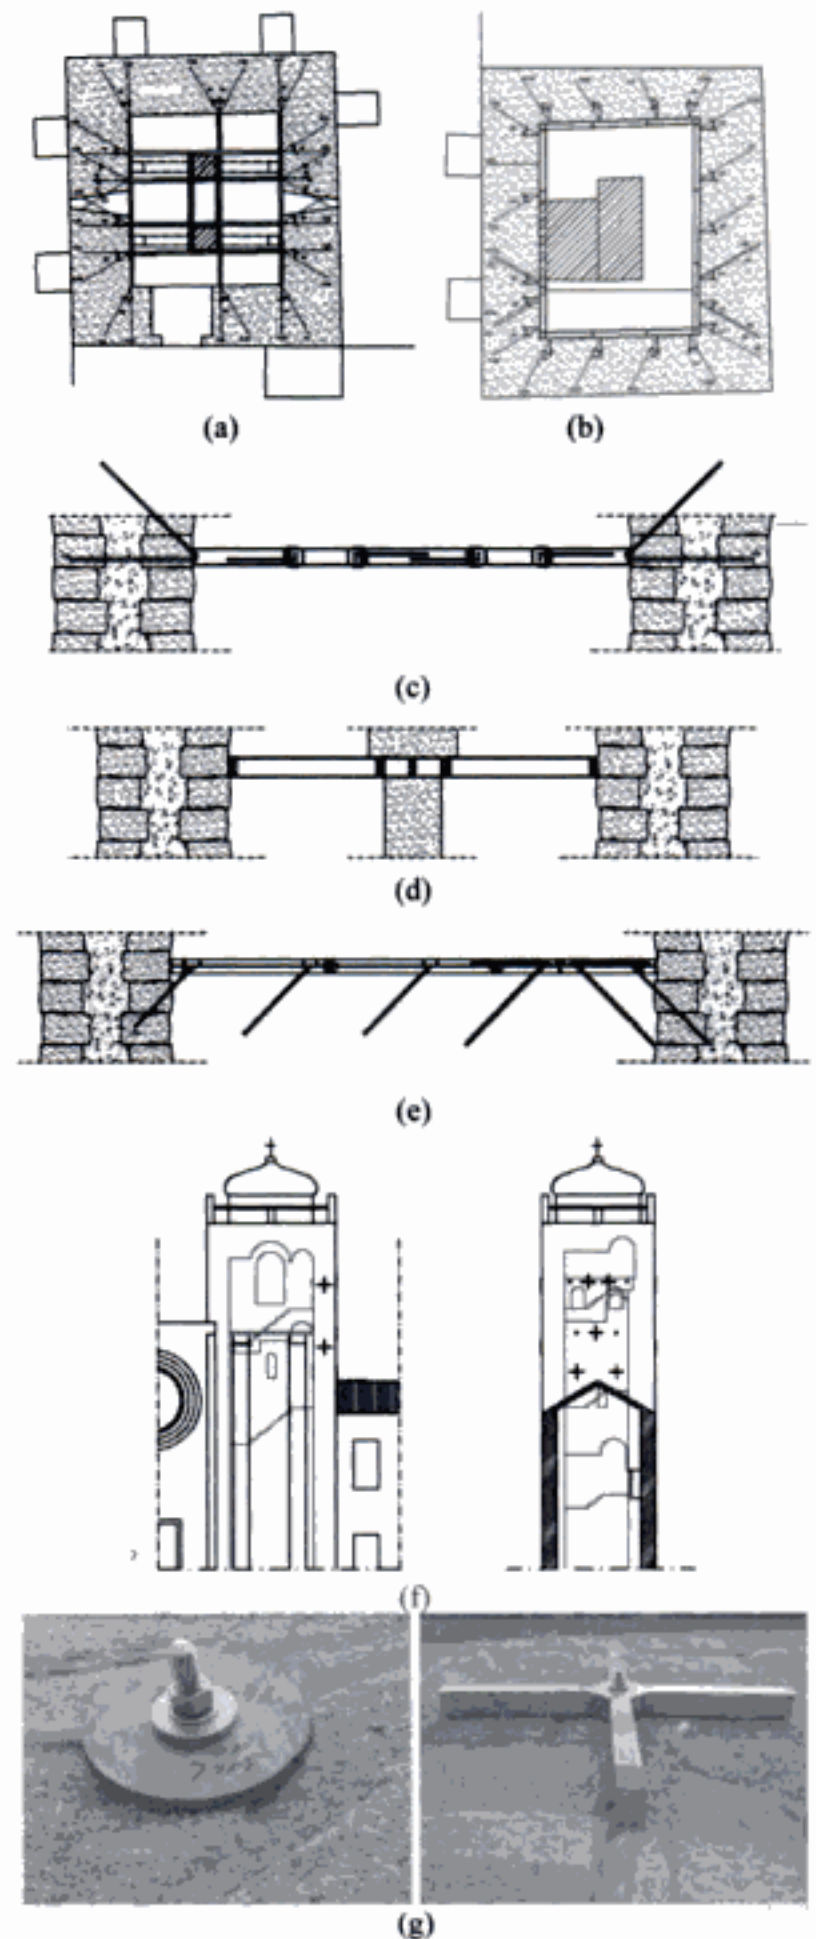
Aspect of the strengthening of the towers using stainless steel rings and long inclined anchorages: (a) plan of the ring for the North tower; (b) plan of the ring for the South tower; (c) North-South section for North tower; (d) West-East section for North tower; (e) typical section for South tower; (f) additional ties placed in the West and South façades of the South tower; (g) details of the anchorage plates.
